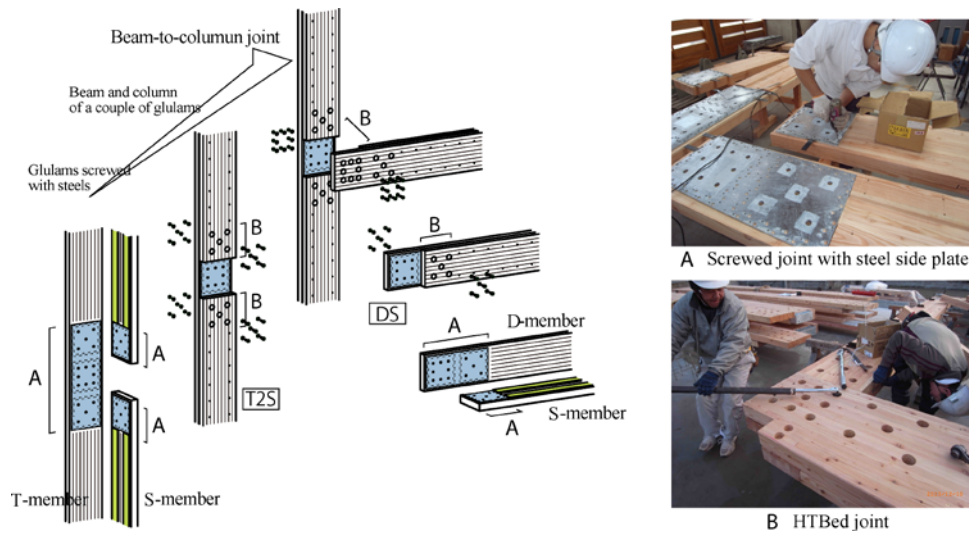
Configuration of beam-to-column joints of the proposed semi-rigid timber frame
